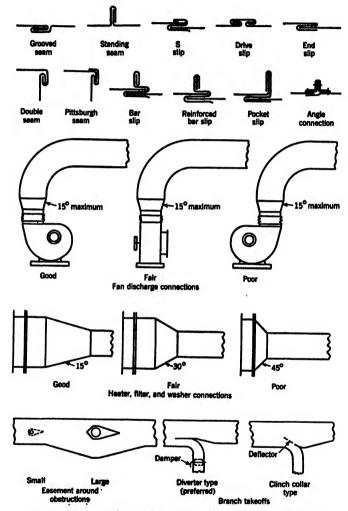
SHEET METAL DUCT AND ARRANGEMENT DETAILS
